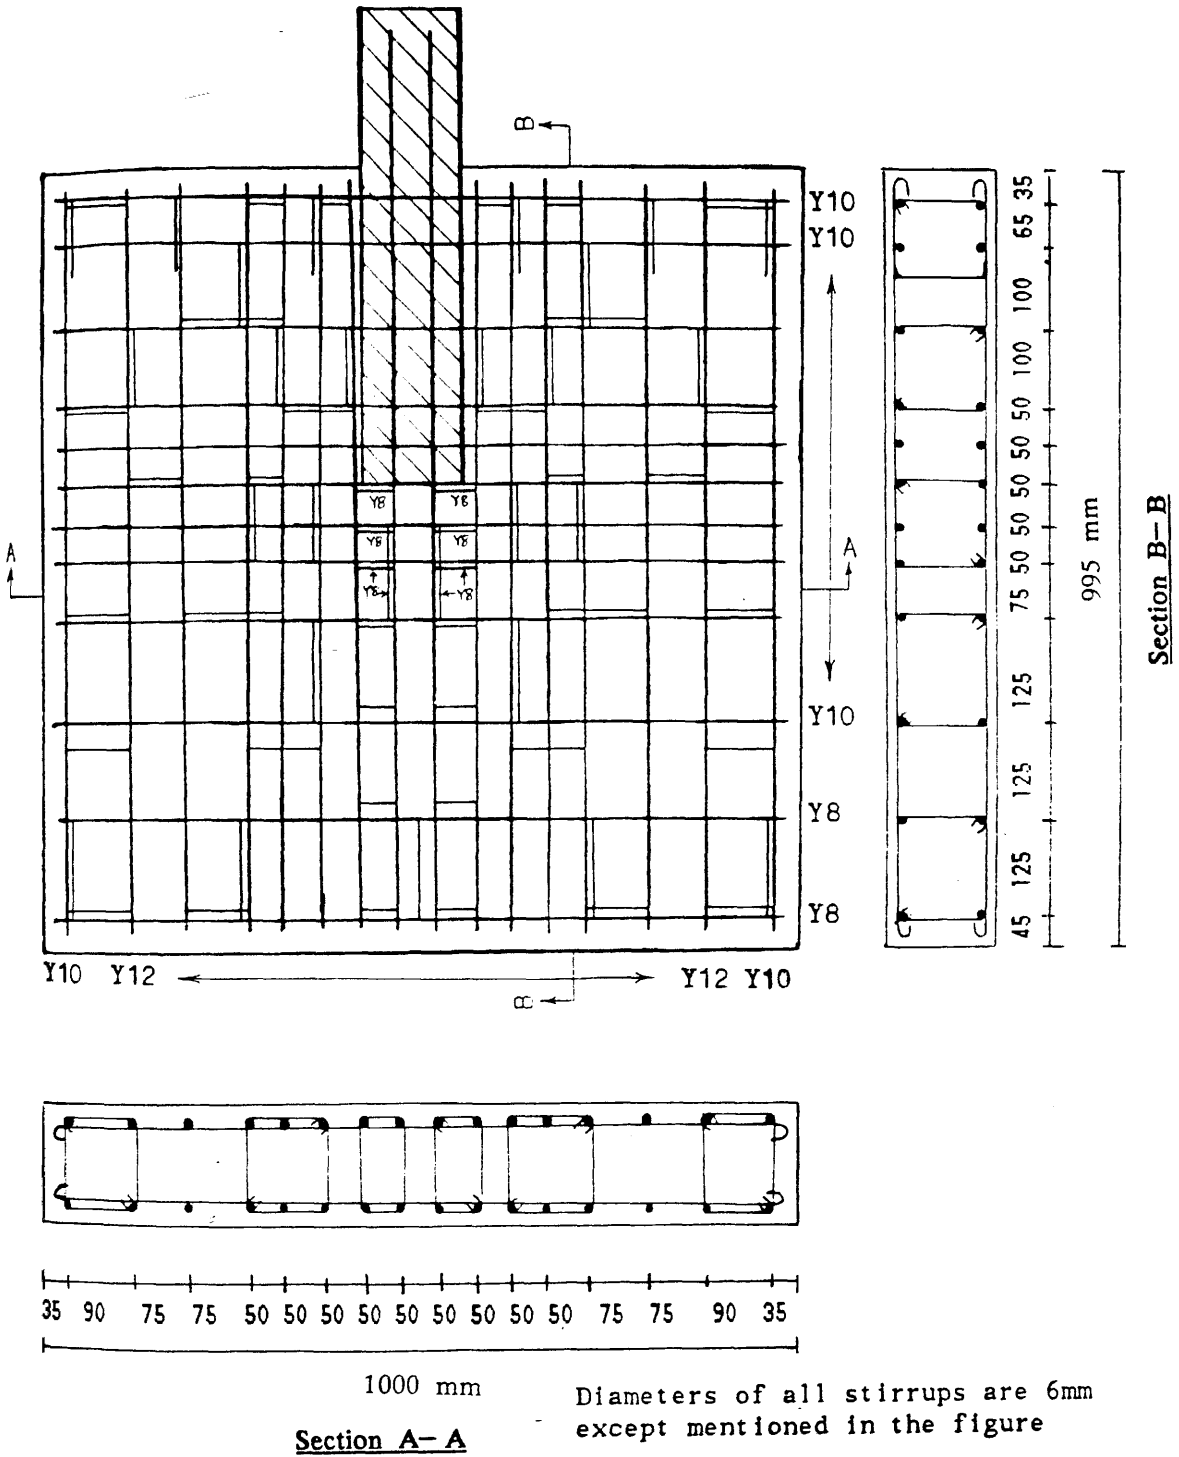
a) : Arrangement of top reinforcing bars including closed vertical stirrup in the slab of model MS5
